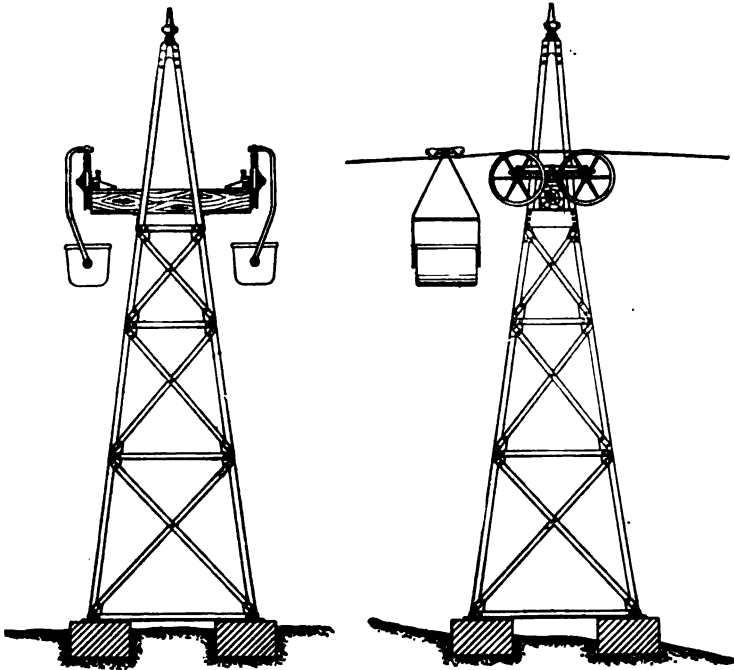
Elevation of Steel Trestle with Pair Balanced Sheaves.
